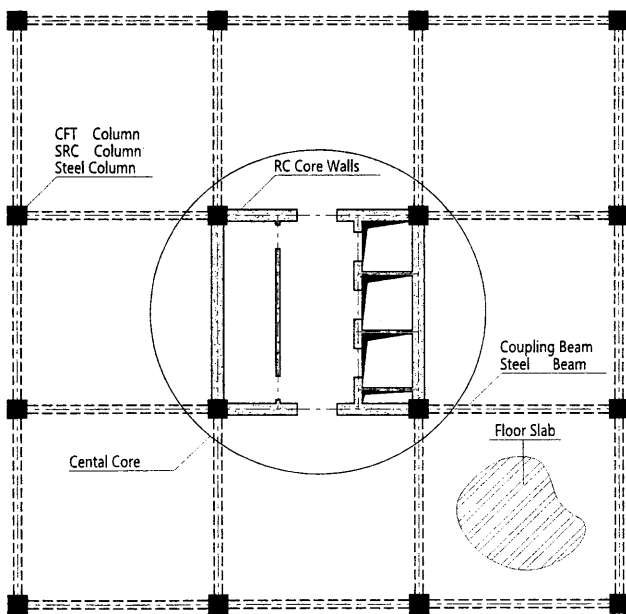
Floor plan of reinforced concrete core wall-perimeter frame system
